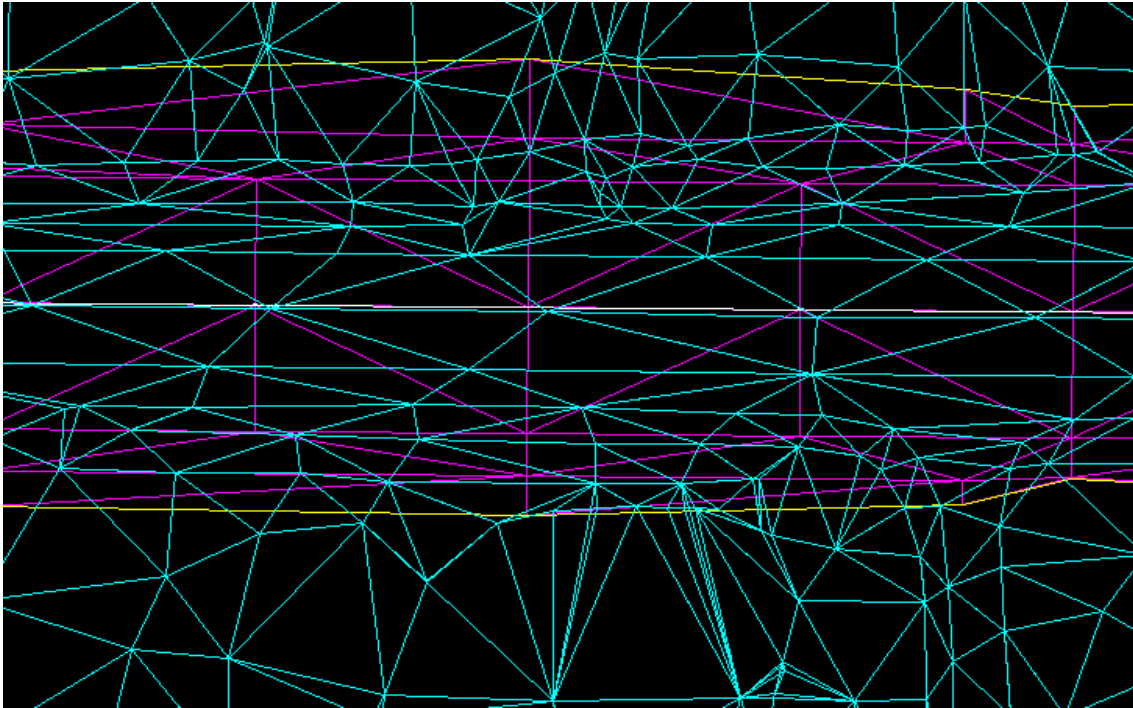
Close-Up Plan View of a Section of Bi-Directional Roadway
